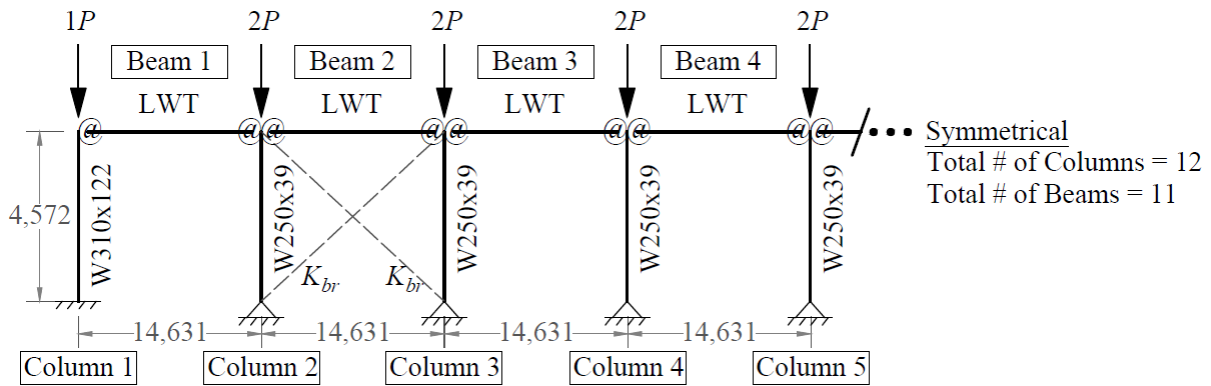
Eleven-bay frame subjected to proportional gravity loading
